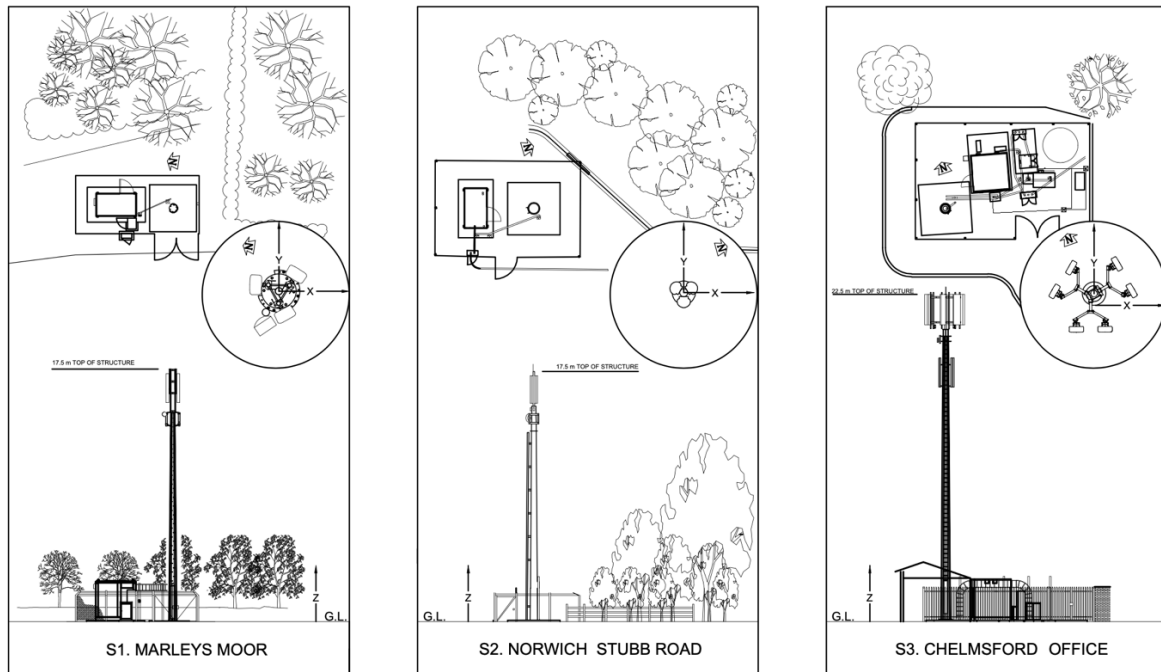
Elevation and Plan View of Field Test Sites. A. S1 Marleys Moor. B. S2 Norwich Stubb Road. C. S3 Chelmsford Office.
